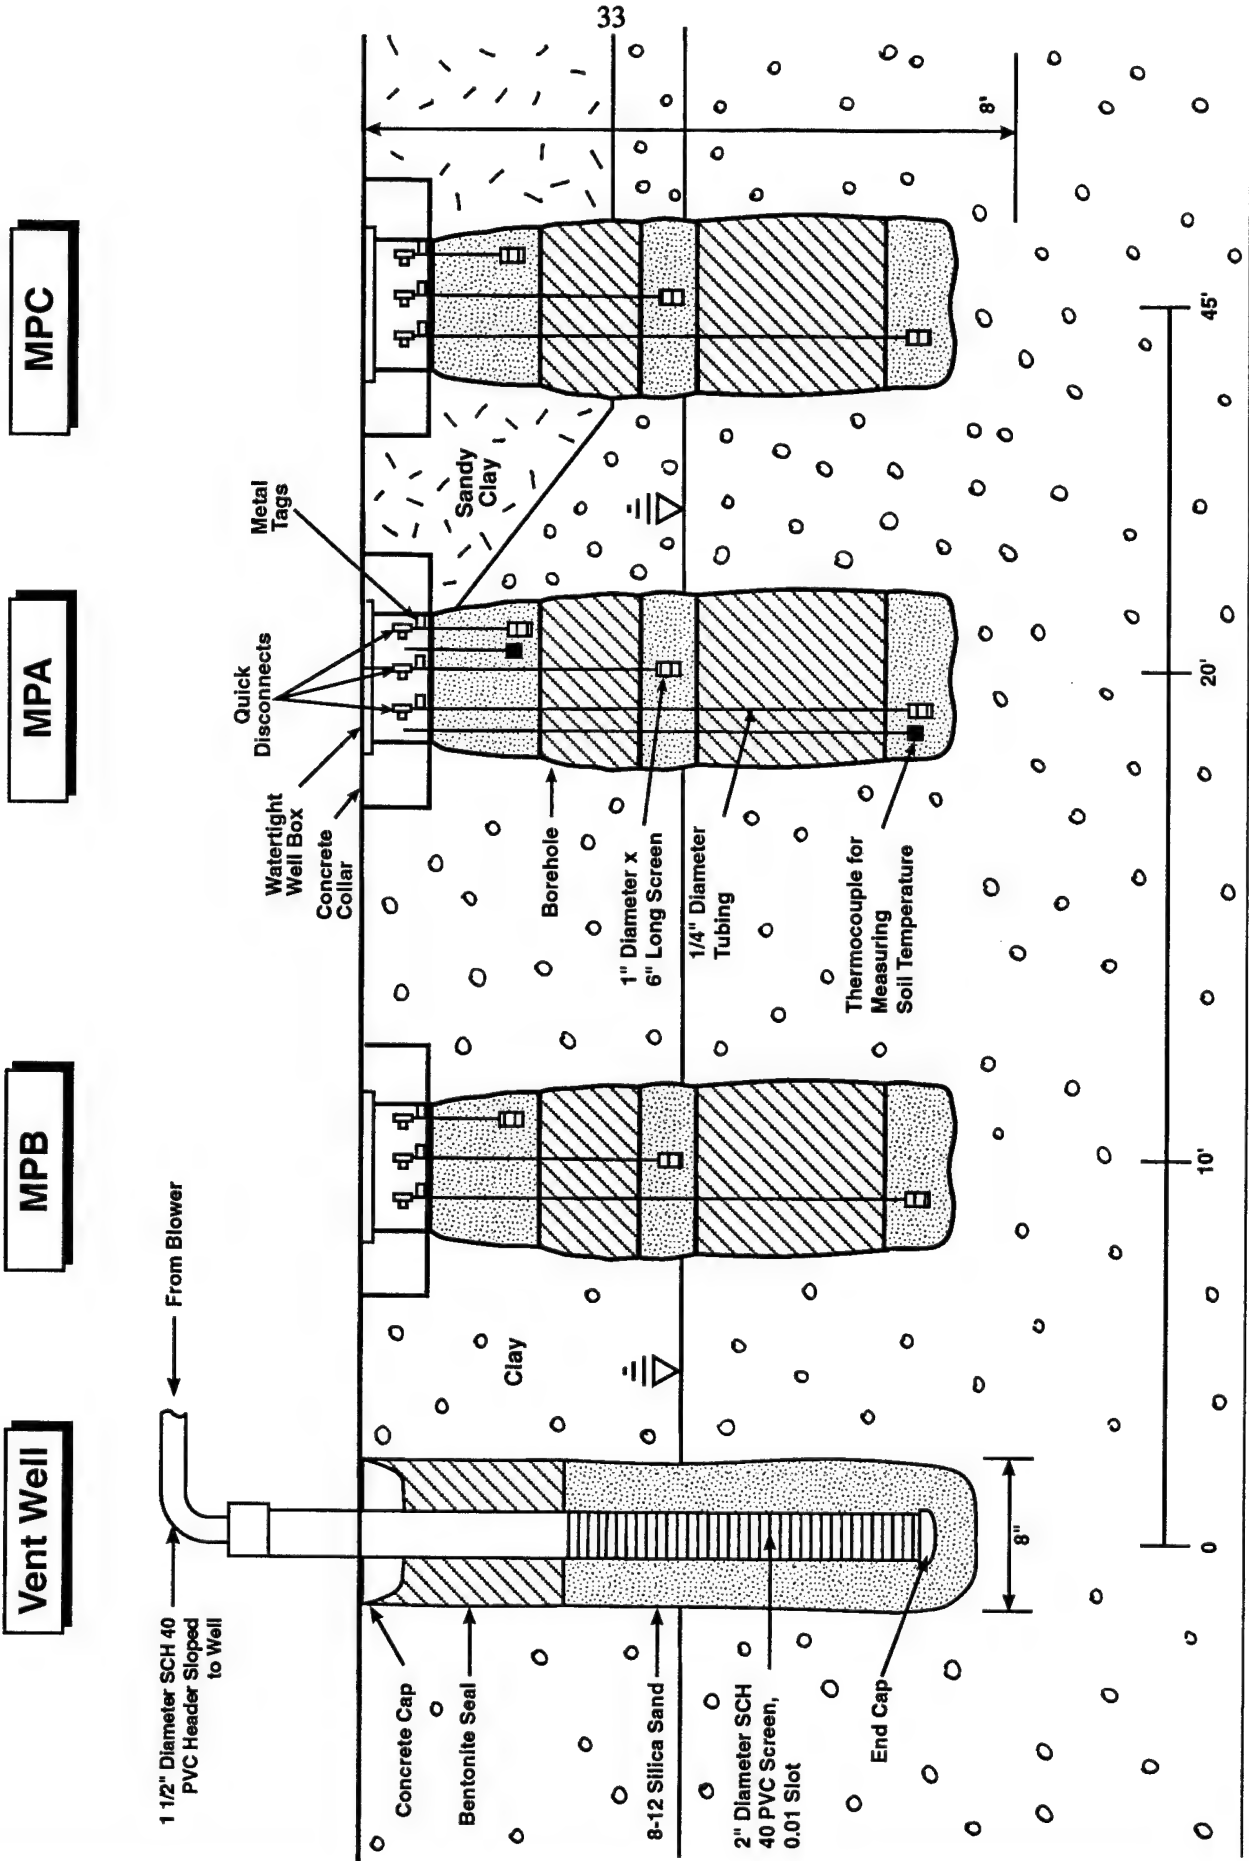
Cross Section of Vent Well and Monitoring Points at Facility 14 Showing Site Lithology and Construction Detail
